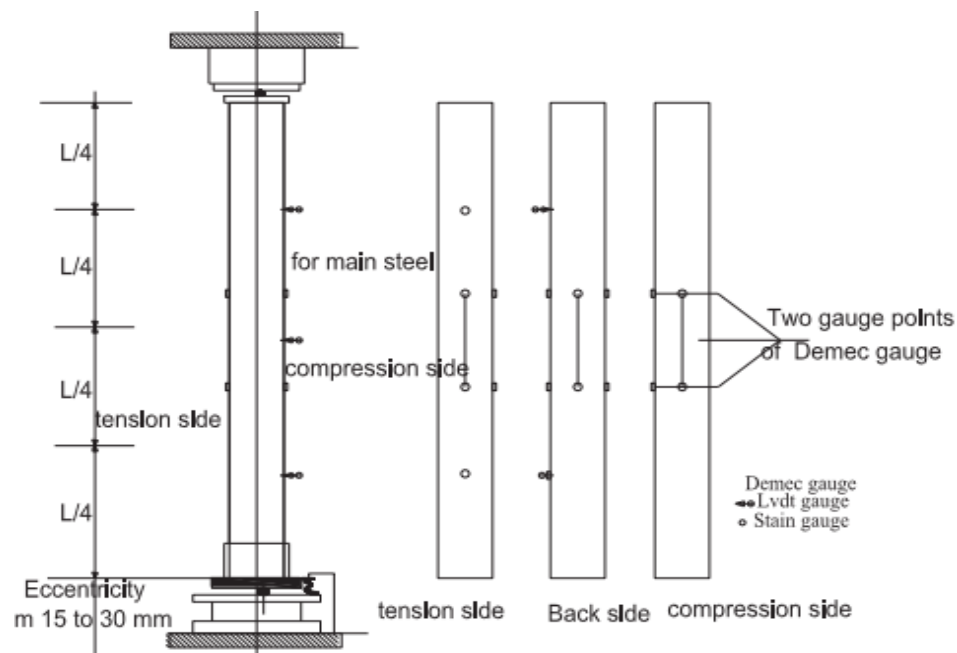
Column setup, demec points and details ( Hany A.Kottb et al., 2015.
